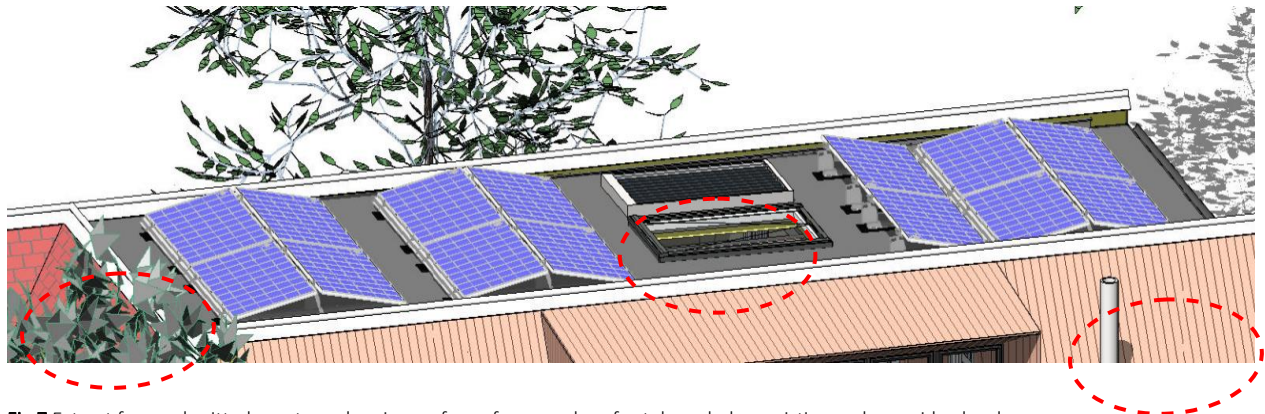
Extract from submitted montage showing surface of mansard roof set down below existing and new ridge levels
